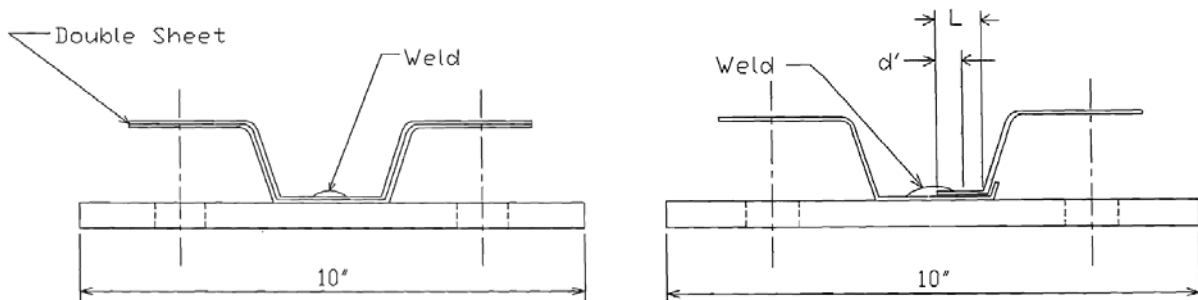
Double sheet interior weld and side-lap weld configurations (LaBoube and Yu, 1991).
